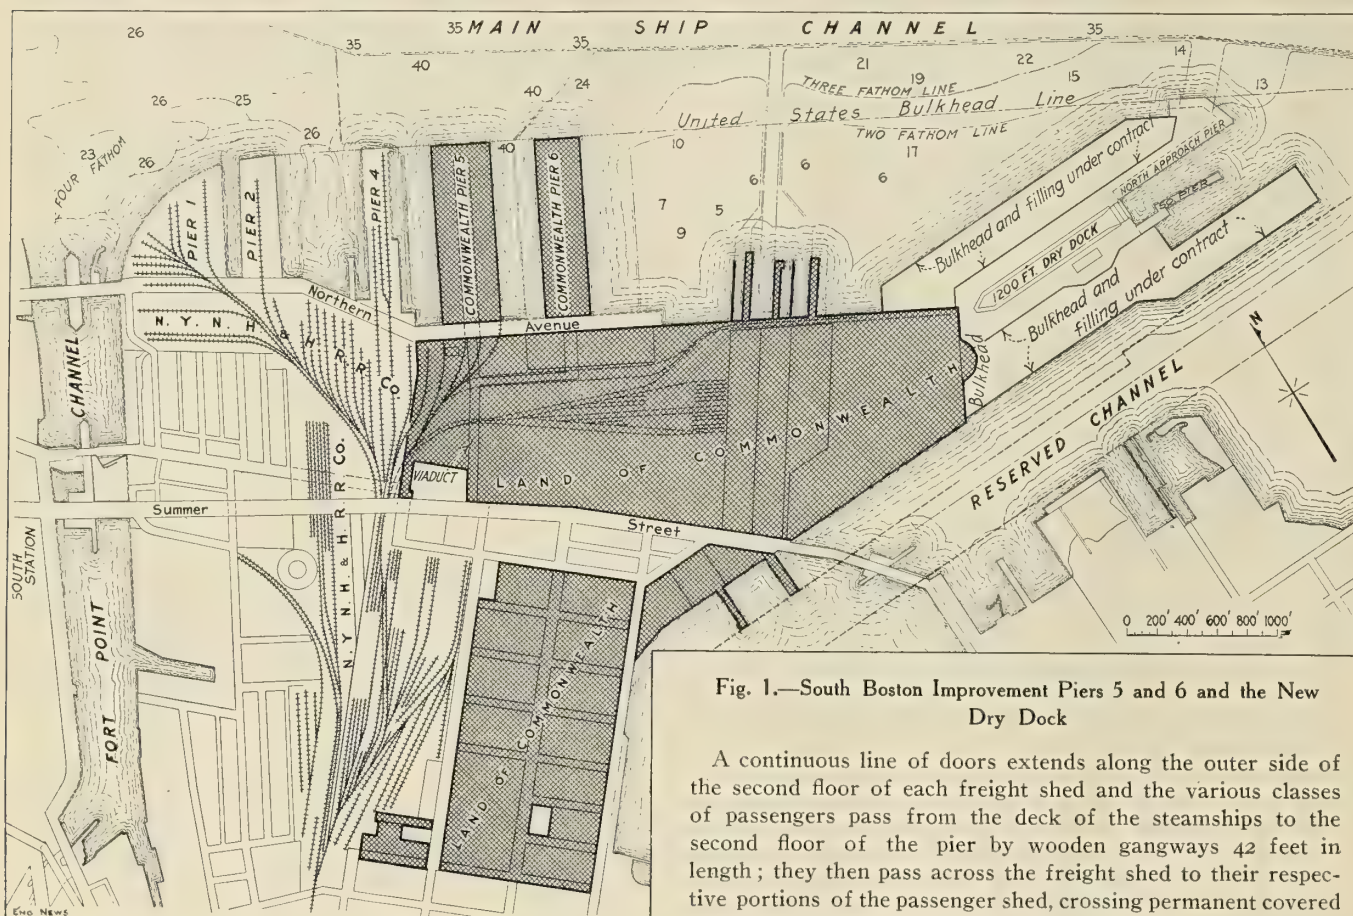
South Boston Improvement Piers 5 and 6 and the New Dry Dock
